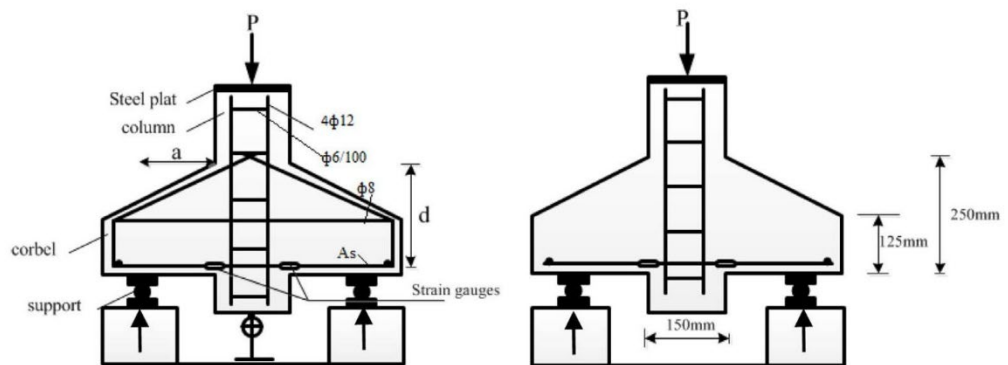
Steel arrangement and geometry and loading scheme of the corbel specimen (Ridha et al. 2017).
